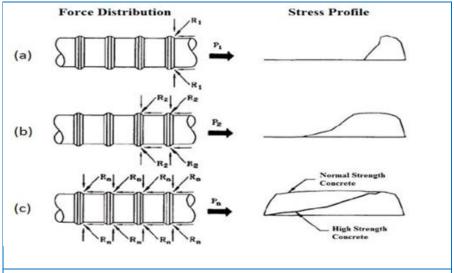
Behavior of steel reinforcing bars under tension in concrete (a) Minimal axial load; (b) developing load; and (c) high load [52].
